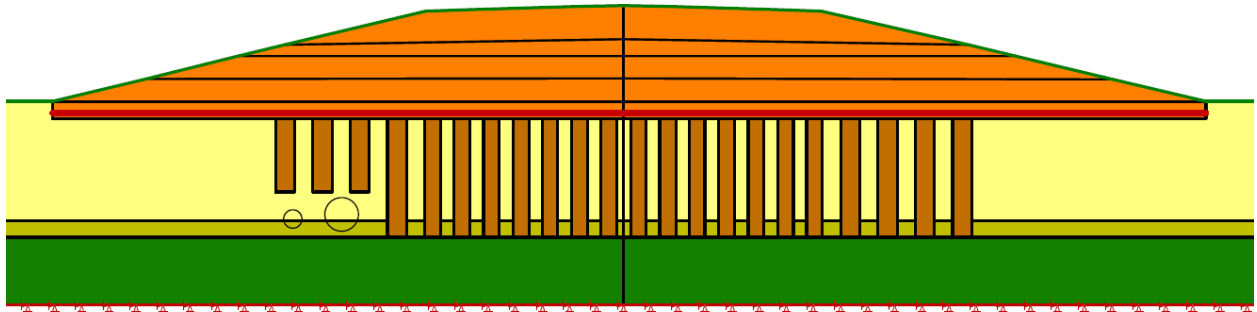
FEM South Abutment Cross-Section Model Case TREK
